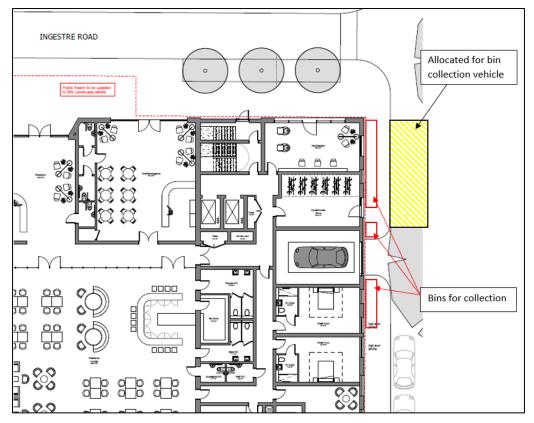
Ground Floor Plan showing waste collection area and temporary bin storage
